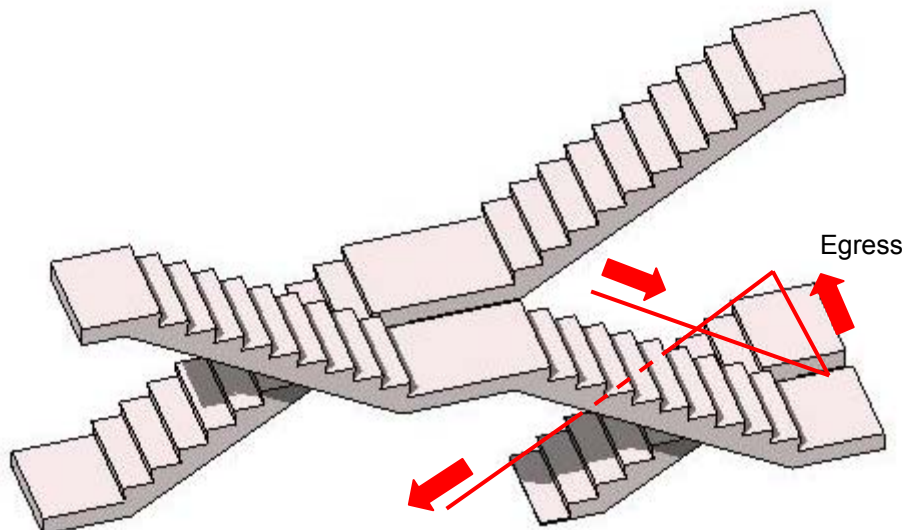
3D View of Typical Scissor Stair System between Two Adjacent Levels
